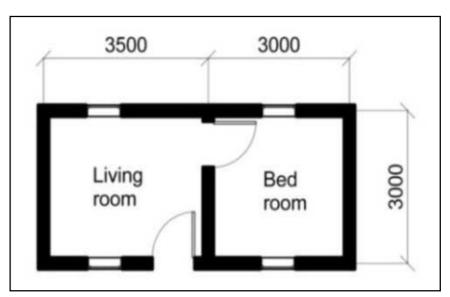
Floor Plan of Colonial Igala Wife's House. Source: Field Survey (2017).
